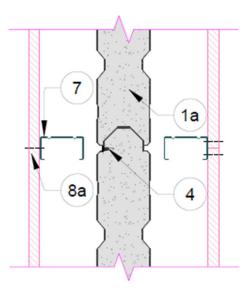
Plan view of 78 mm Speedpanel with 13 mm fire rated plasterboard attached to steel frame on both sides of the Speedpanel wall – option 9
